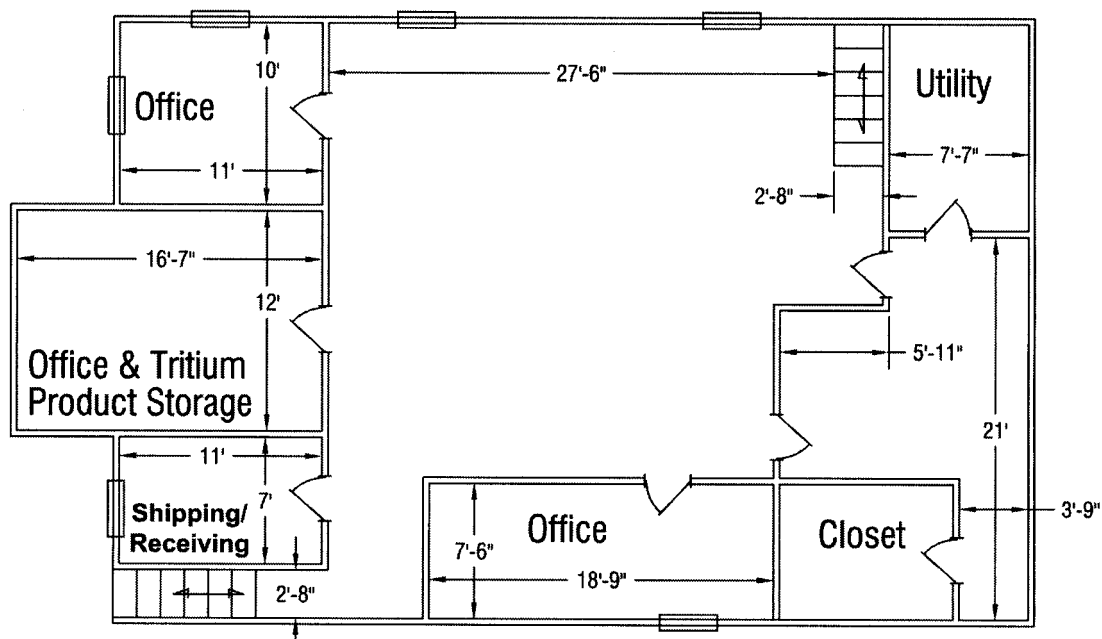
Ground Floor of Isolite Facility, Berwyn, PA
